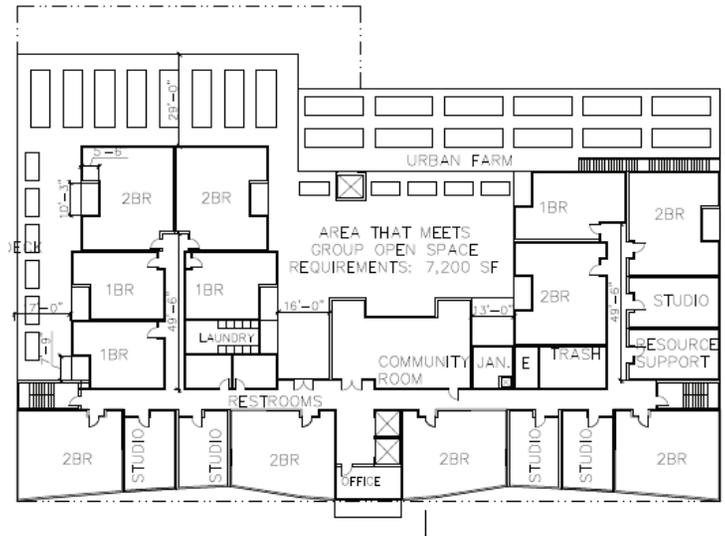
Project Site Plan, Source: MWA Architects, June 2020
